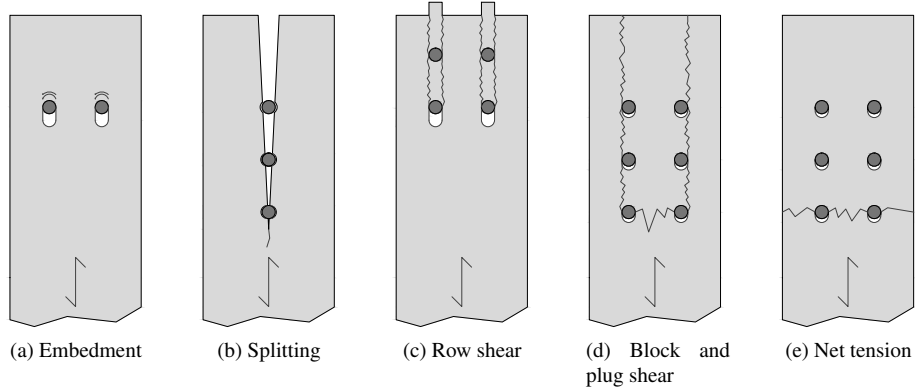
Different possible failure modes of connections loaded parallel-to-grain. Embedment (a) is the only ductile failure mode, the rest are brittle.
